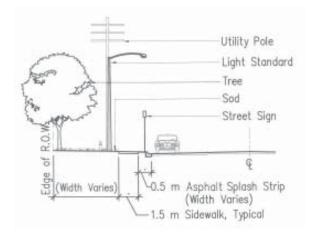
c - Existing Road Edge Condition 2 Sidewalk Adjacent Splash Strip
